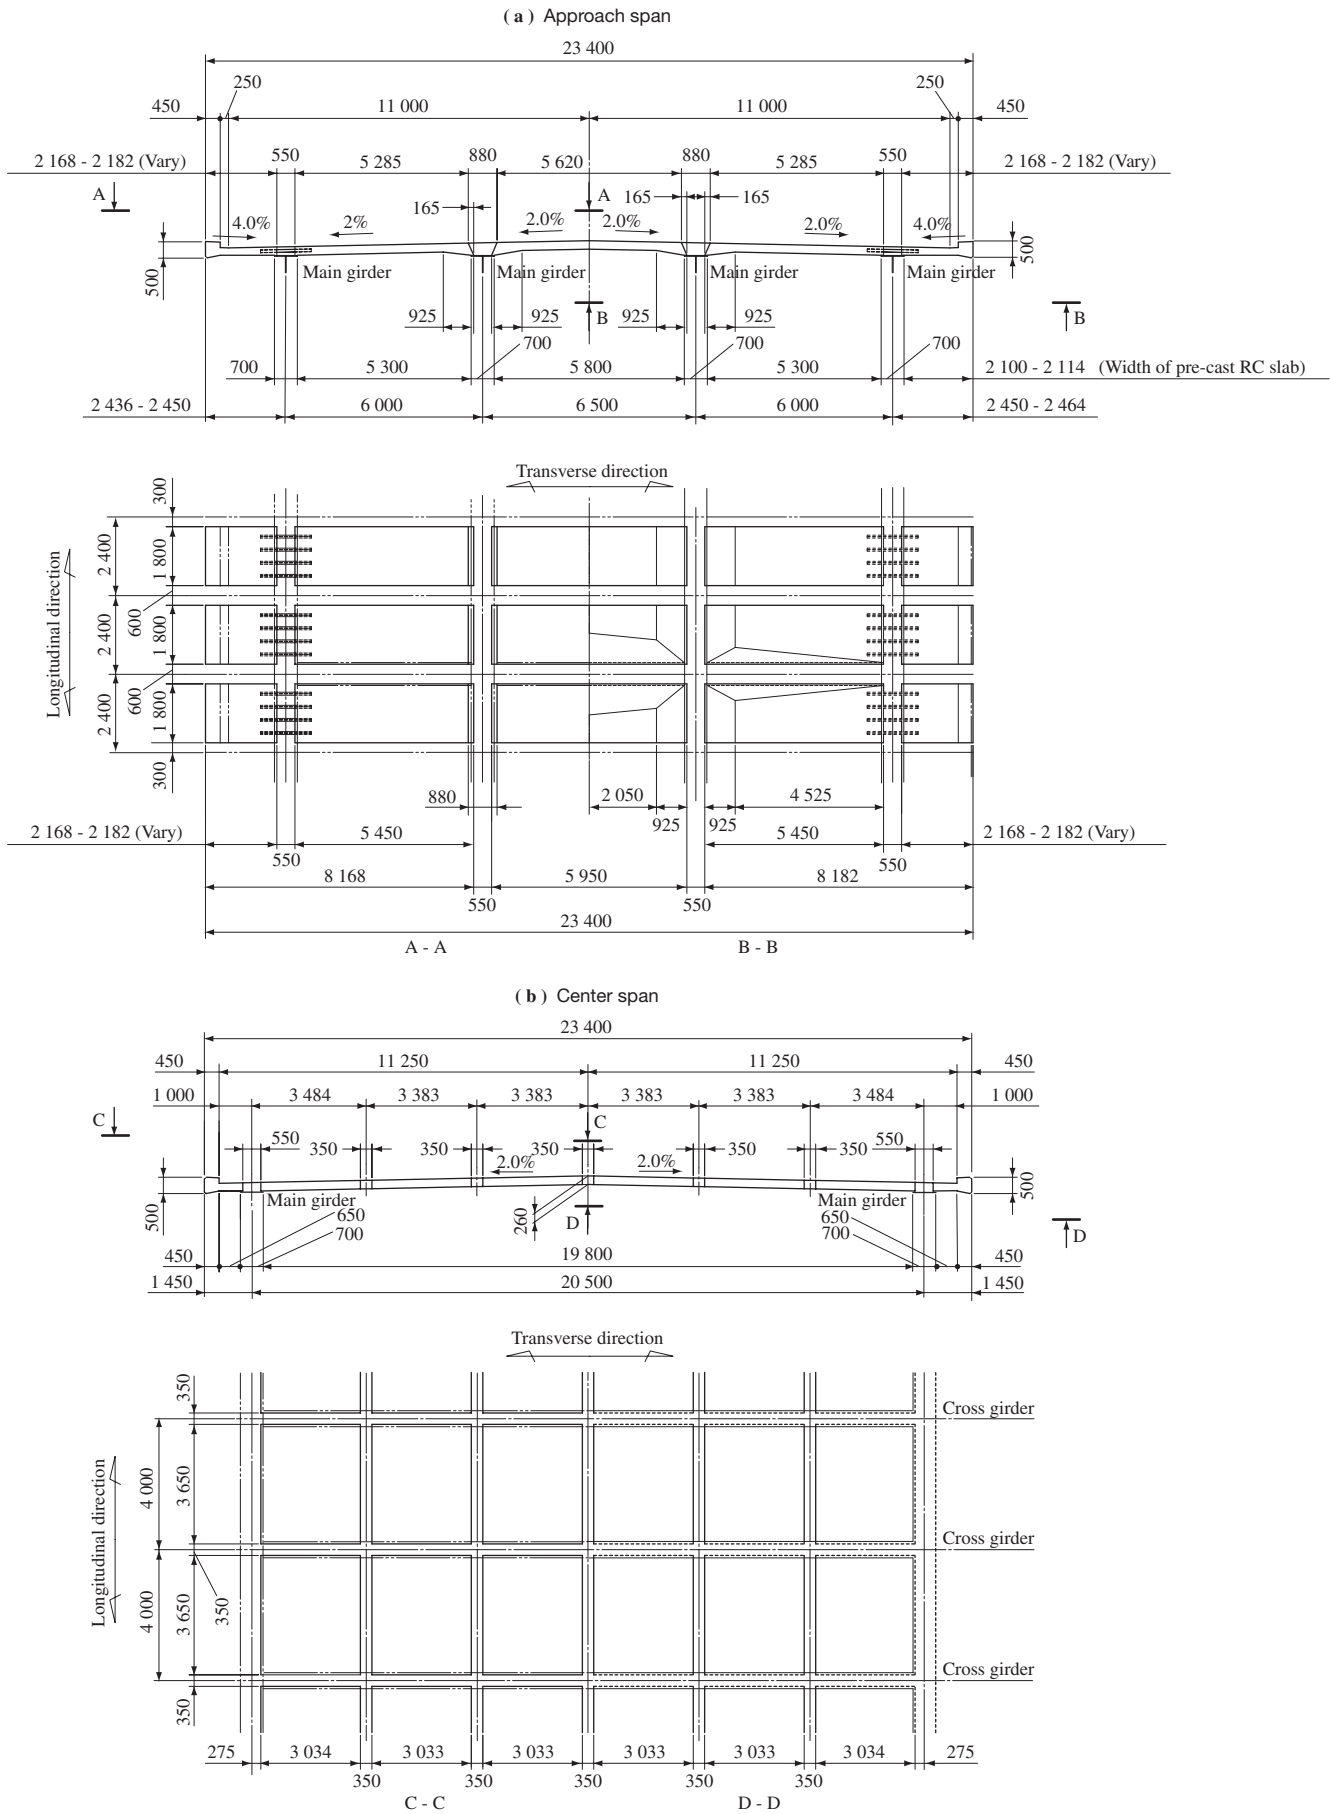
General arrangement of pre-cast RC deck slab (unit : mm)
